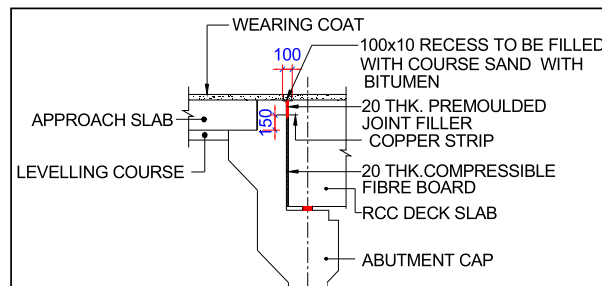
Schematic Diagram of Filler type Expansion Joint
